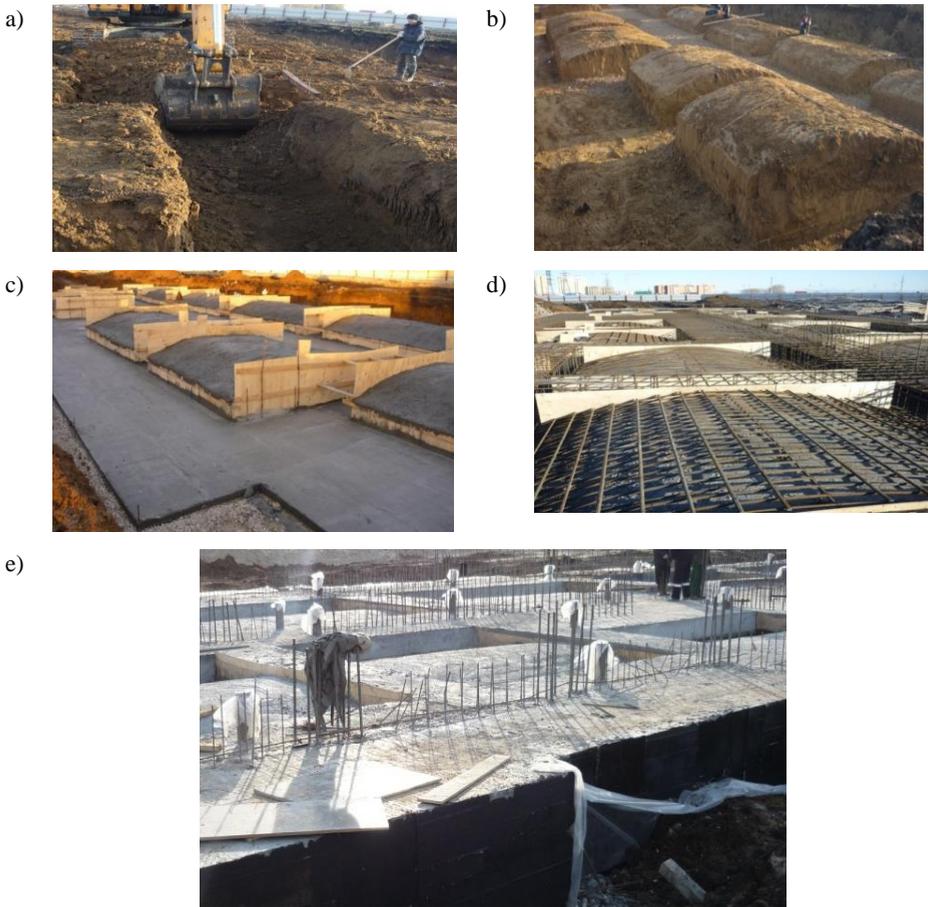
Stages of the foundation: a) trenching for the strip foundations, b) formation of a curved surface for the shells, c) preparation of the site for the concreting, d) installation of reinforcing cages of strip foundations and nets of shells, e) concreting of the foundation.
